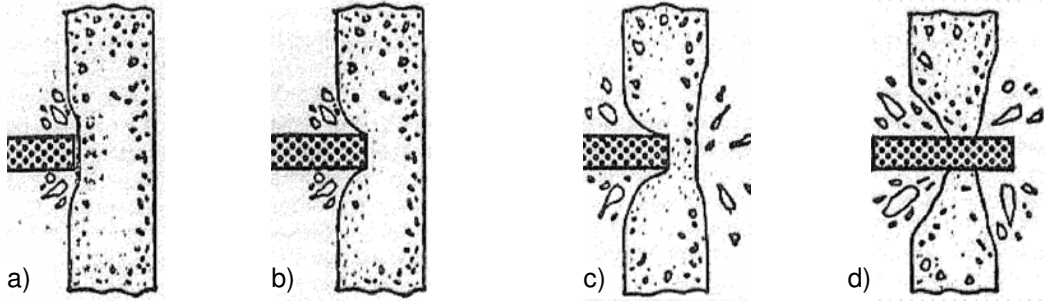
Local damage failure modes: a) Surface failure, b) spalling, c) scabbing and d) perforation.
